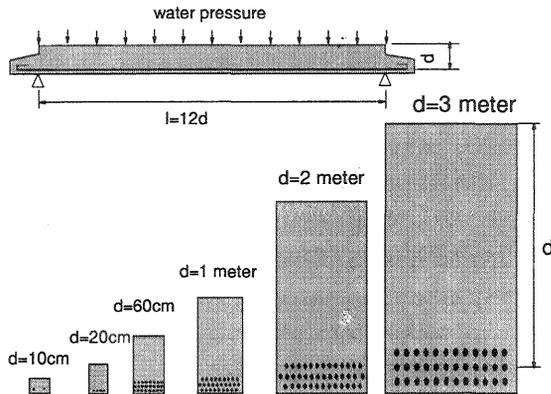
Details of cross sections and arrangement of reinforcing bars
